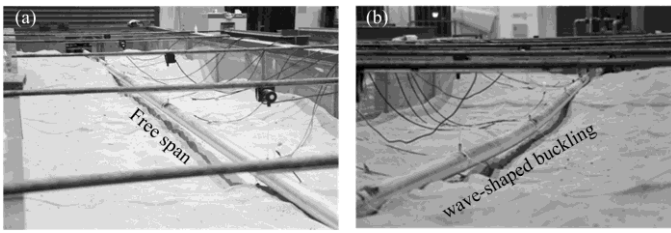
Typical specimen in test: (a) Initial state; (b). Buckling failure mode
